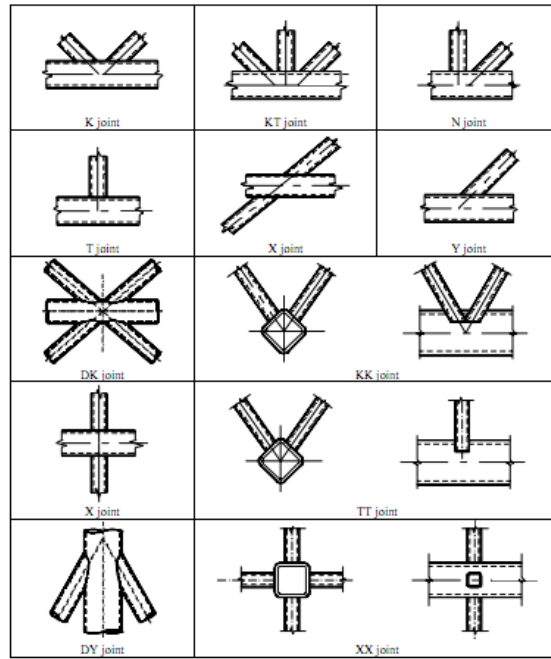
Classification of hollow section connections (EN1993 Part 1.8).
